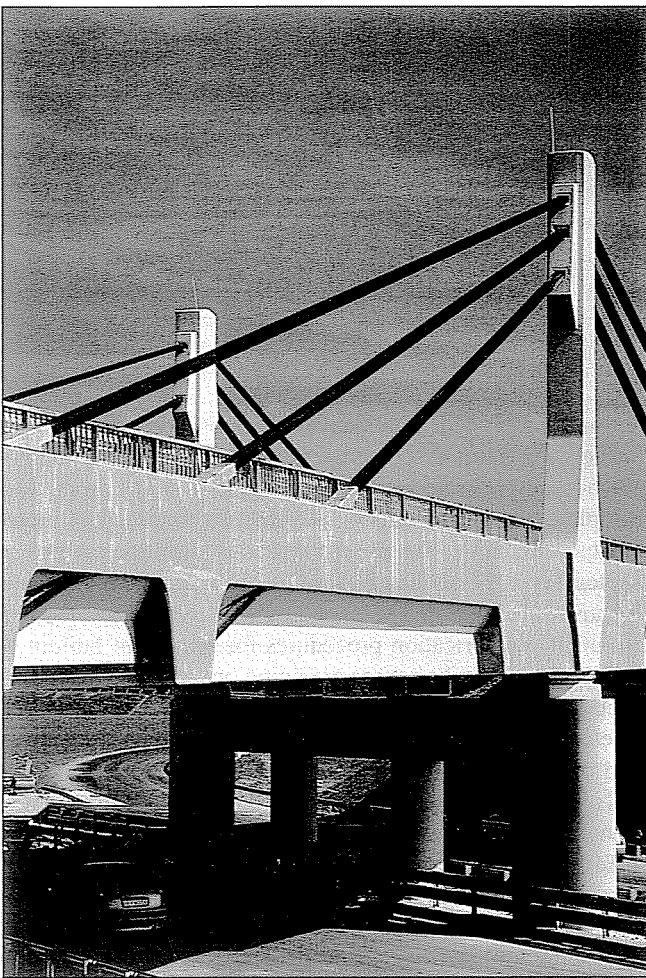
The first Hungarian concrete extradosed bridge (Letenye, 2004)
